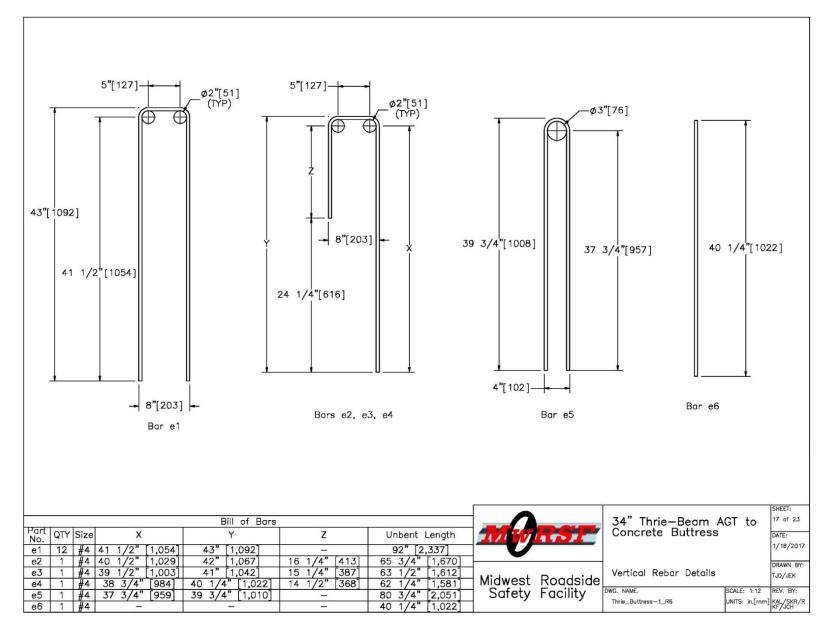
Vertical Rebar Details, Test Nos. 34AGT-1 and 34AGT-2
